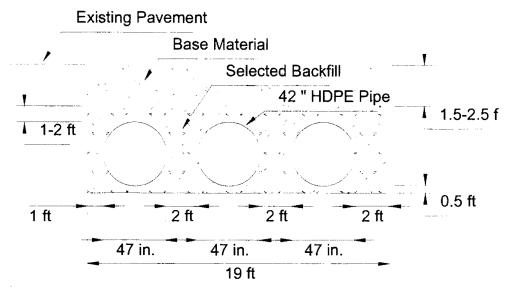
Cross-Section of Installation A1 in Atlanta District.
